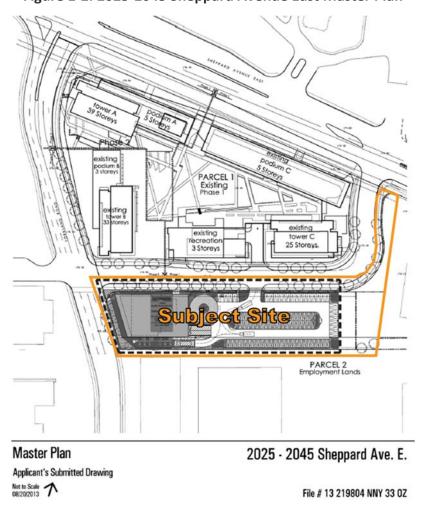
2025-2045 Sheppard Avenue East Master Plan
